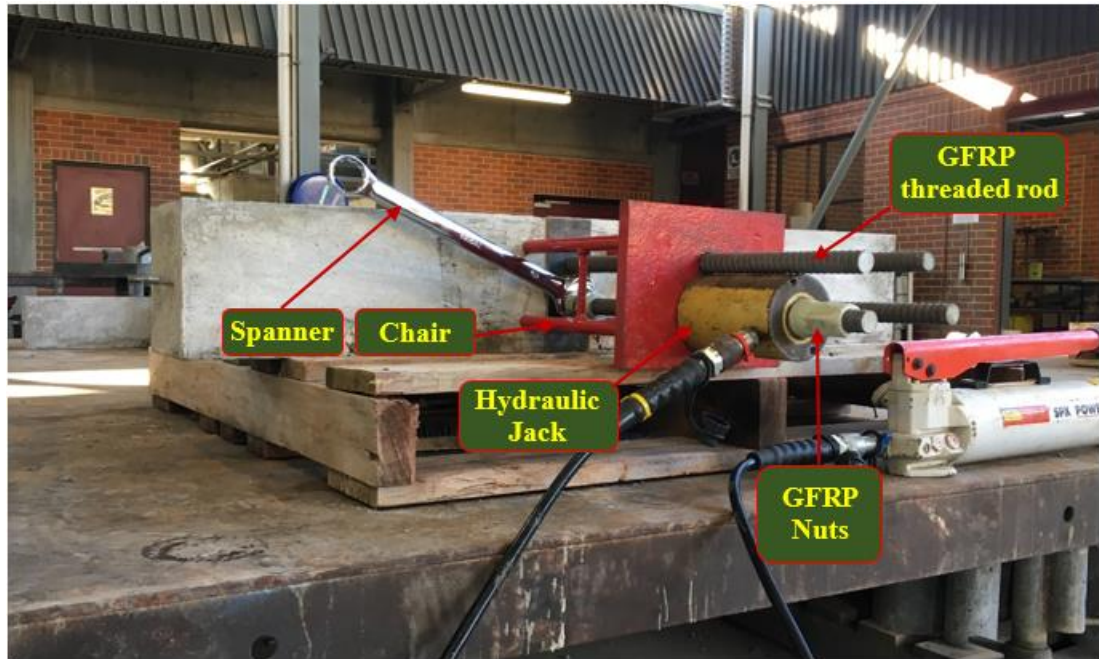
Setup for applying prestress to GFRP bolts.
